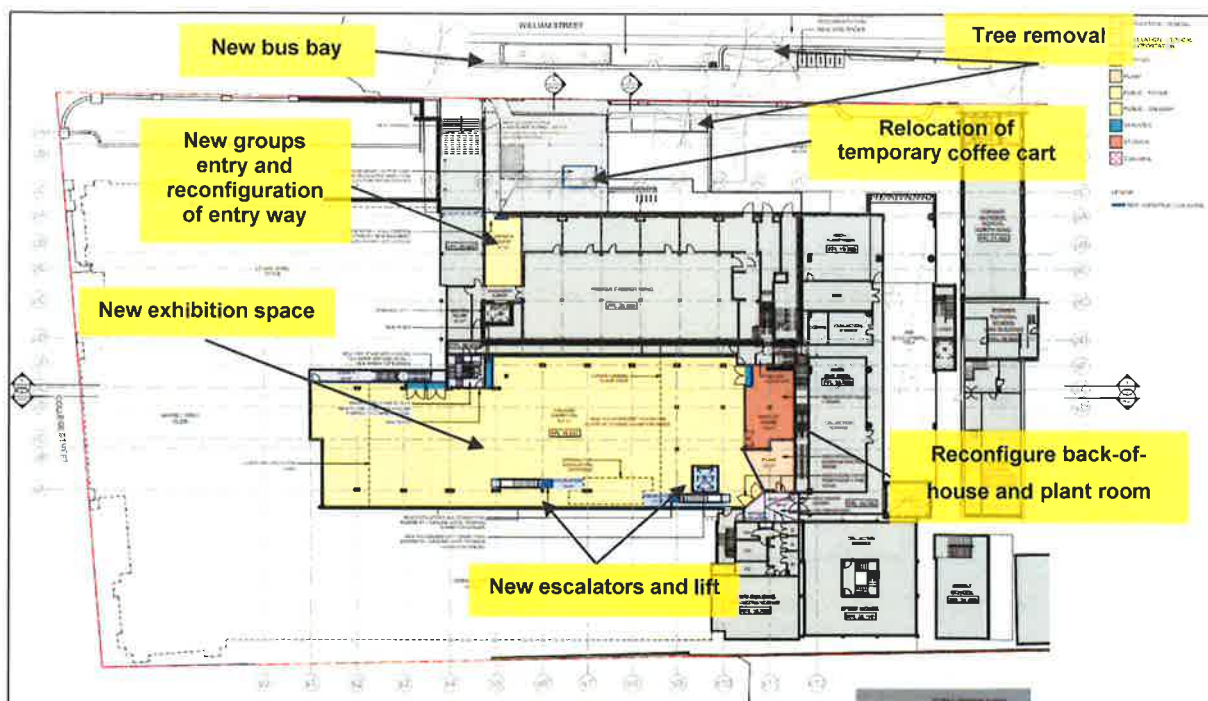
| Basement level and public domain floor plan (Source: Applicant's RtS).
